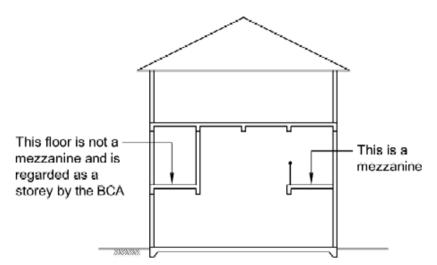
Section showing when an enclosed floor is regarded as a storey [4].
